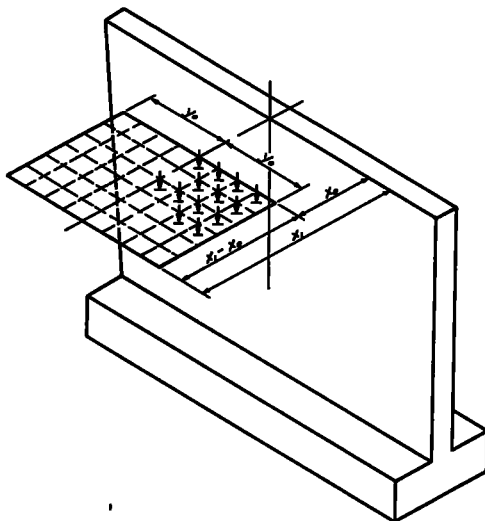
Diagrammatic Sketch of an Area Load Adjacent to a Retaining Wall
